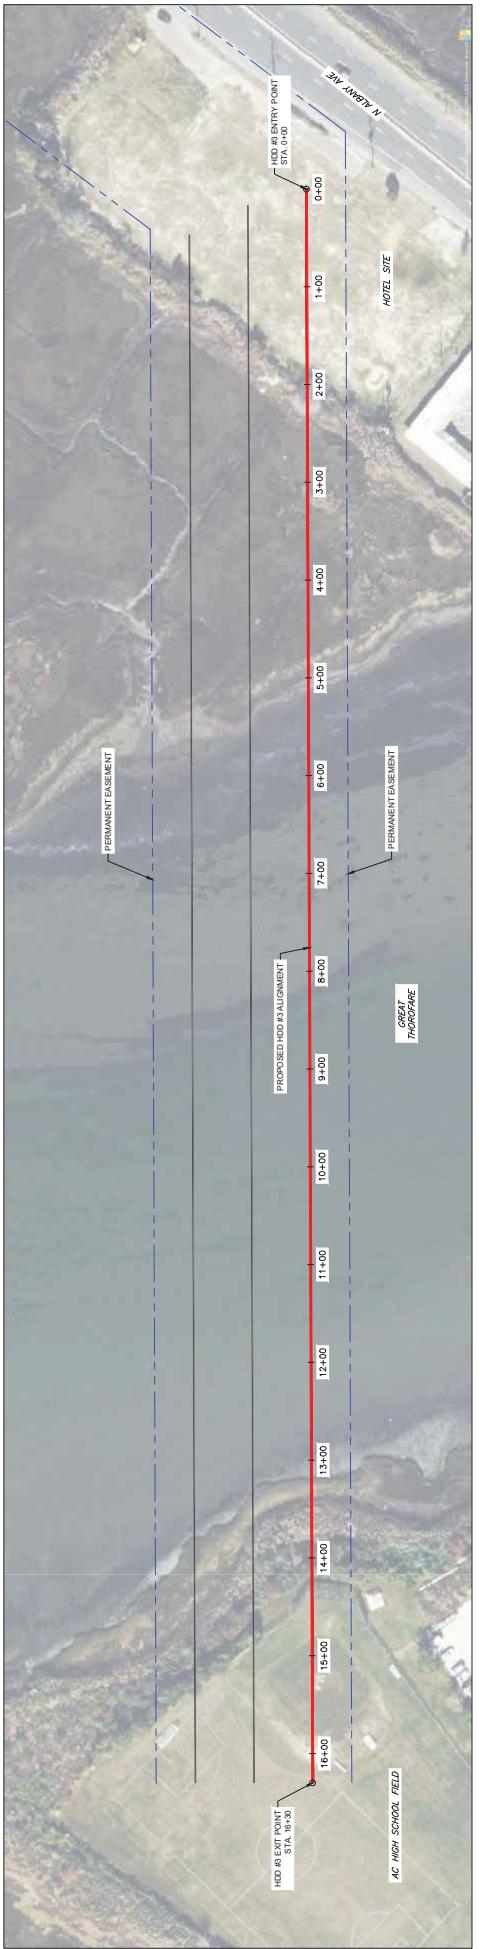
Great Thorofare Crossing #5 HDD Plan & Profile
